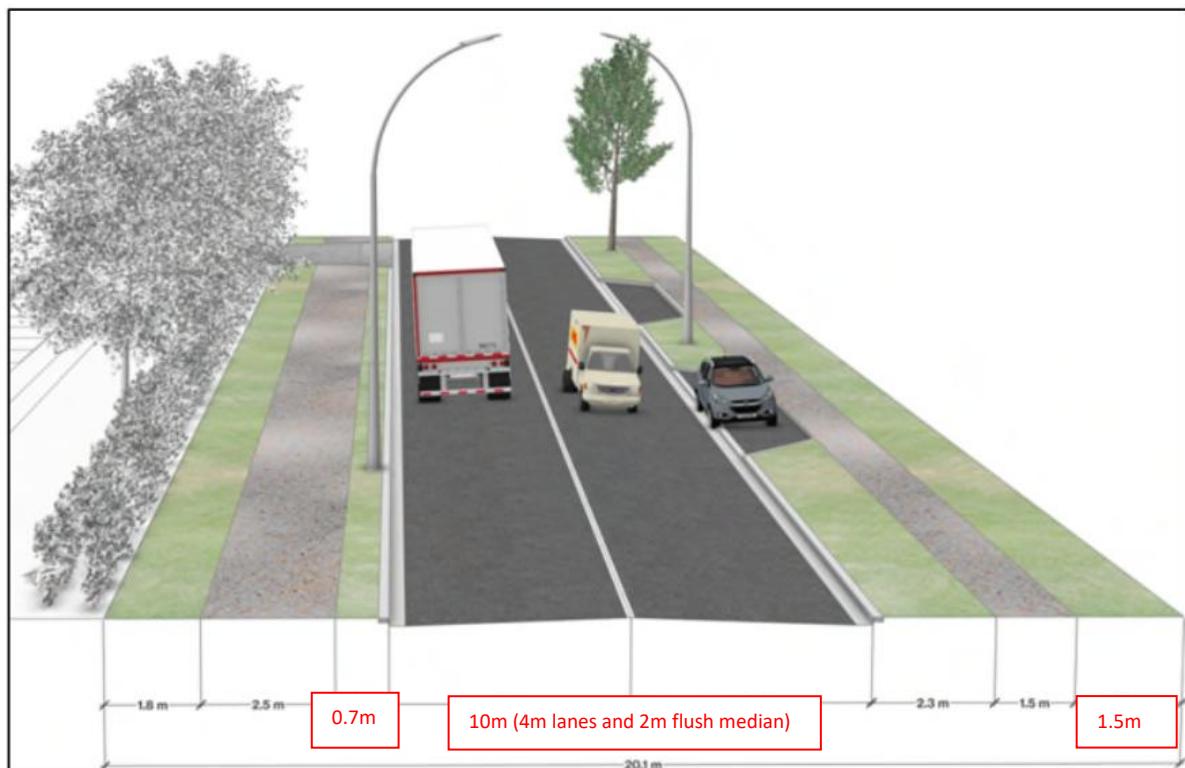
Recommended cross -section for Old Ruffell Road upgrade to collector (Figure 3.9.2.5.e)
